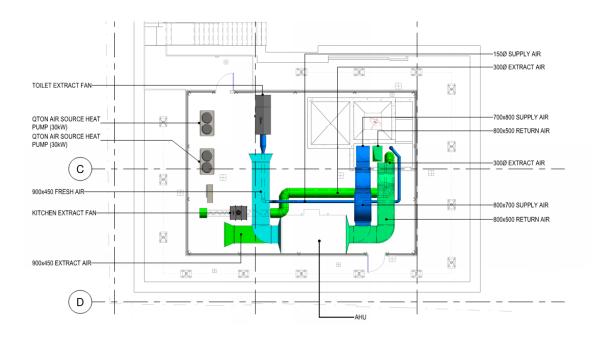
Location of kitchen extract fan located on roof. Note: the discharge will be vertical and shall be 1m above the building roof level.
